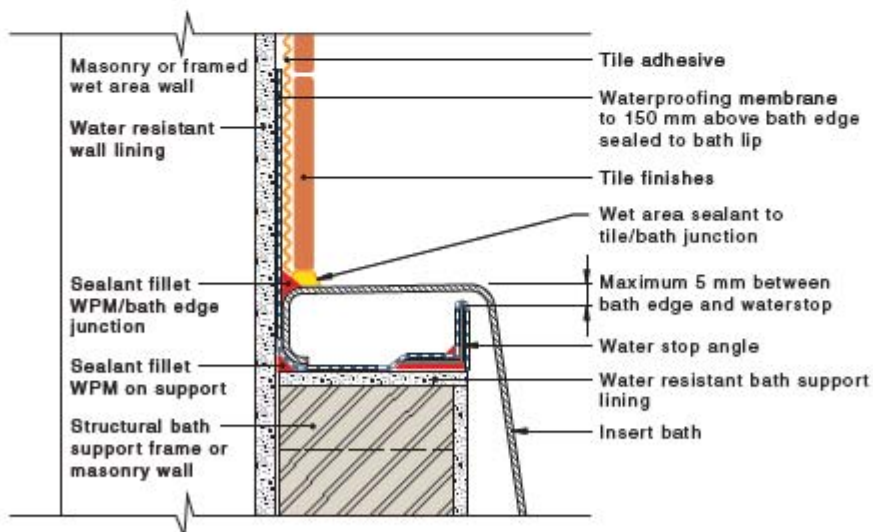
(B) — Shower over bath — Fitted bath — Fitted against wall
